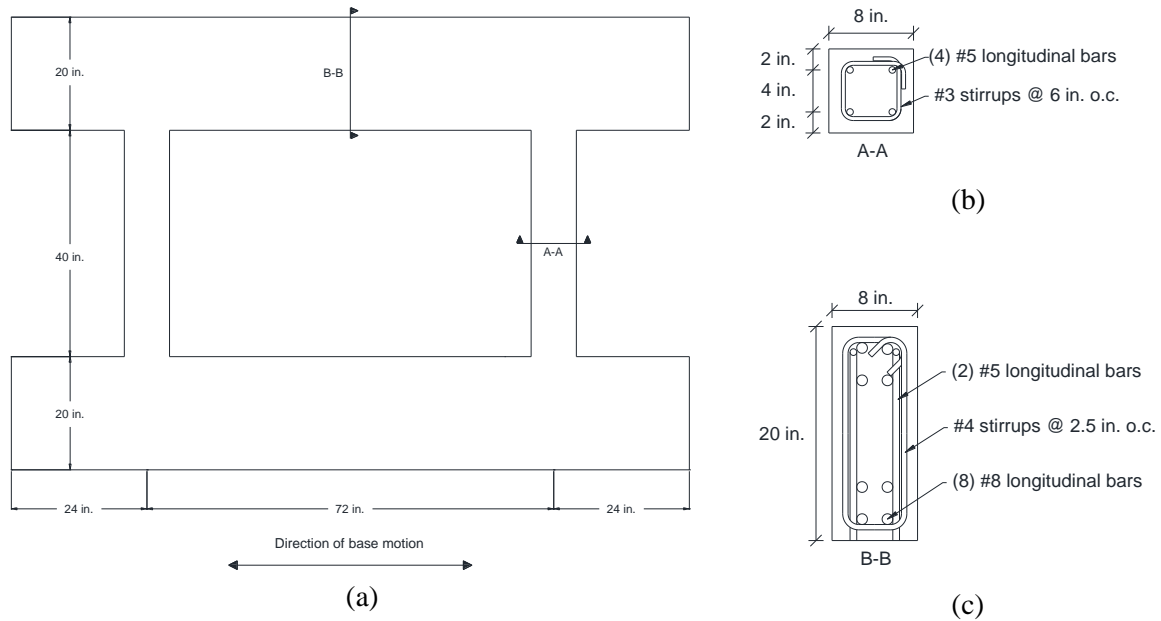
(a) Dimensions of frame, (b) Typical column cross-section, (c) Typical beam cross-section
